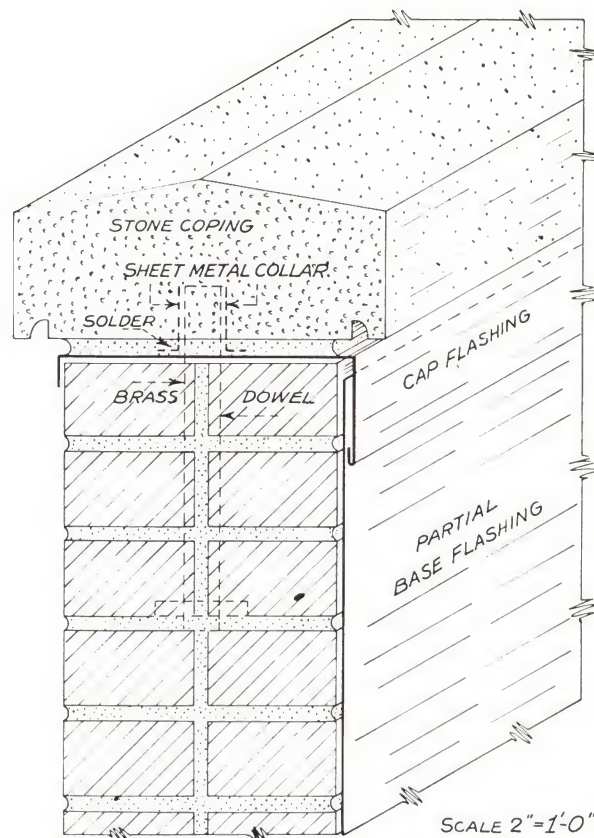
METHOD OF FLASHING A BRICK PARAPET WALL NOT OVER 16 IN. ABOVE ROOF LINE—CAP FLASHING TO COVER FULL WIDTH OF WALL UNDER COPING
